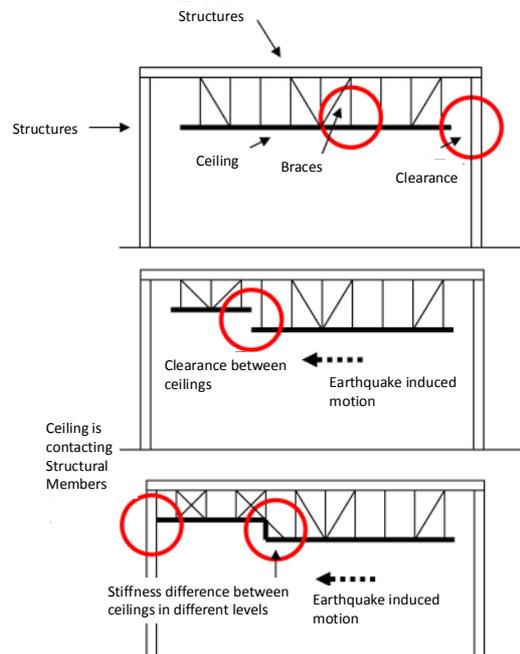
Schematic Explanation of Technical Advice on Details of Ceilings
